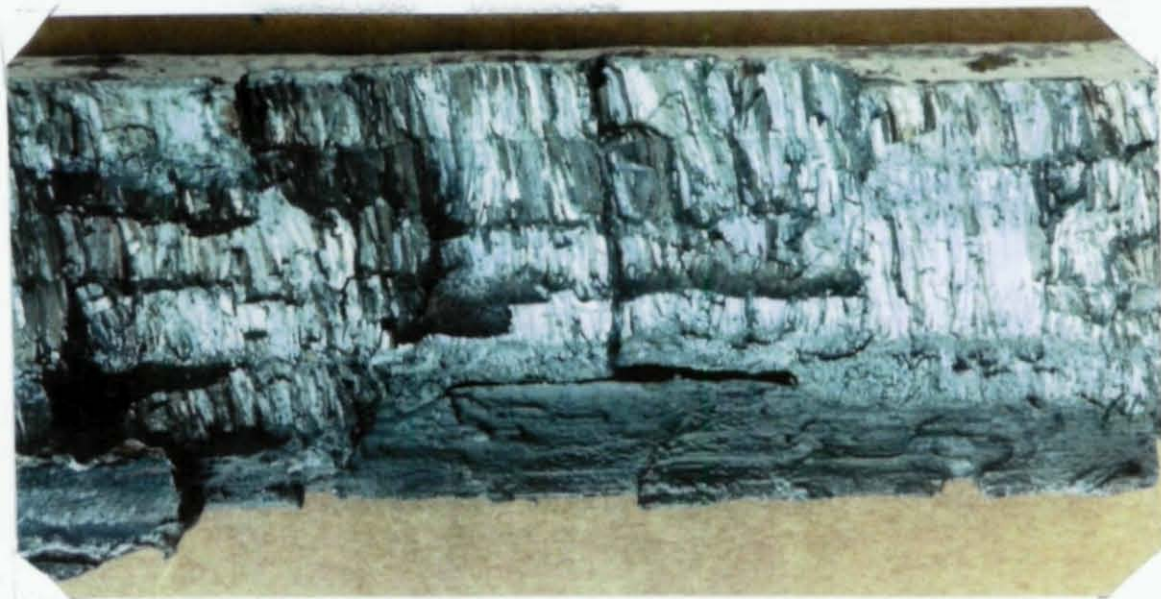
As received fracture pieces from the west-beam top-flange joint.
